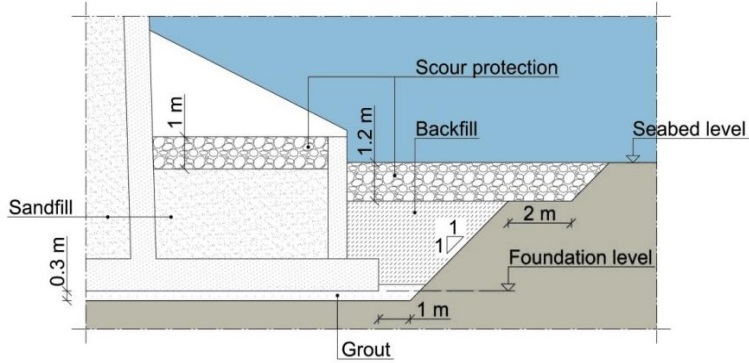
Layout of pier foundations for piers L46 to L5
